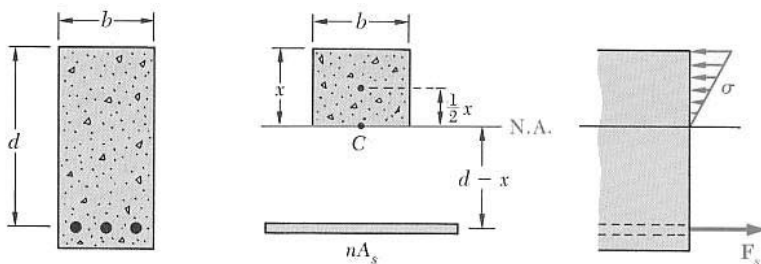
Bending in a concrete beam without and with steel reinforcing.
